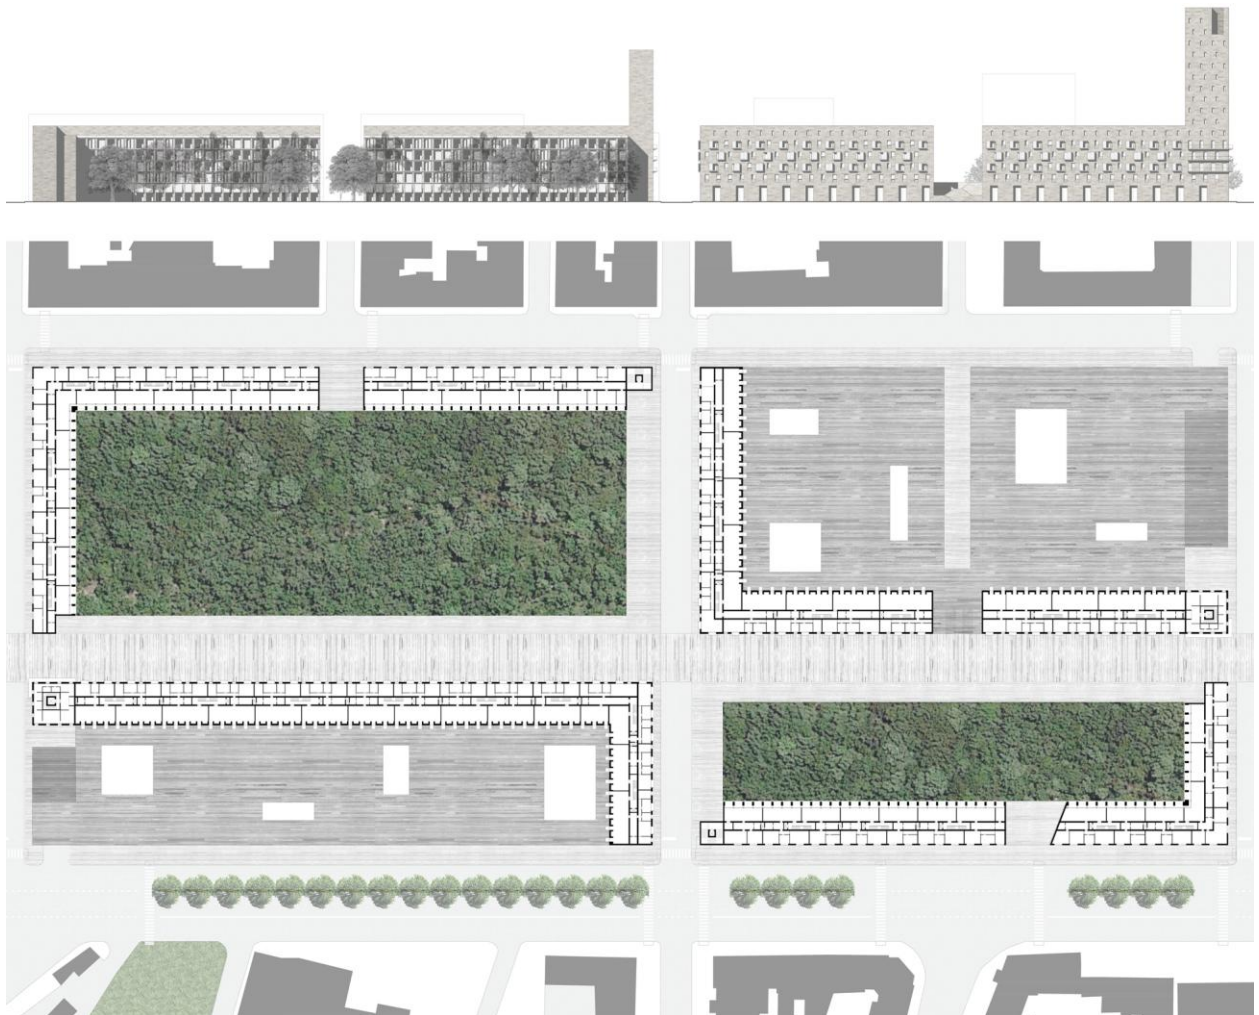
The urban unit. Plan and elevation on the central pedestrian boulevard
